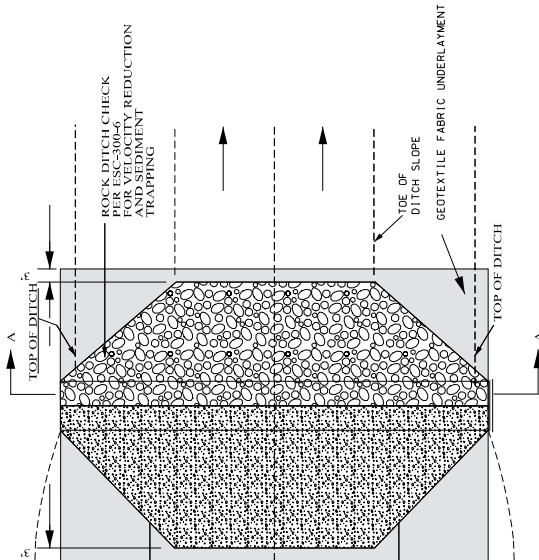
DETAIL FOR SPACING BETWEEN DITCH CHECKS
